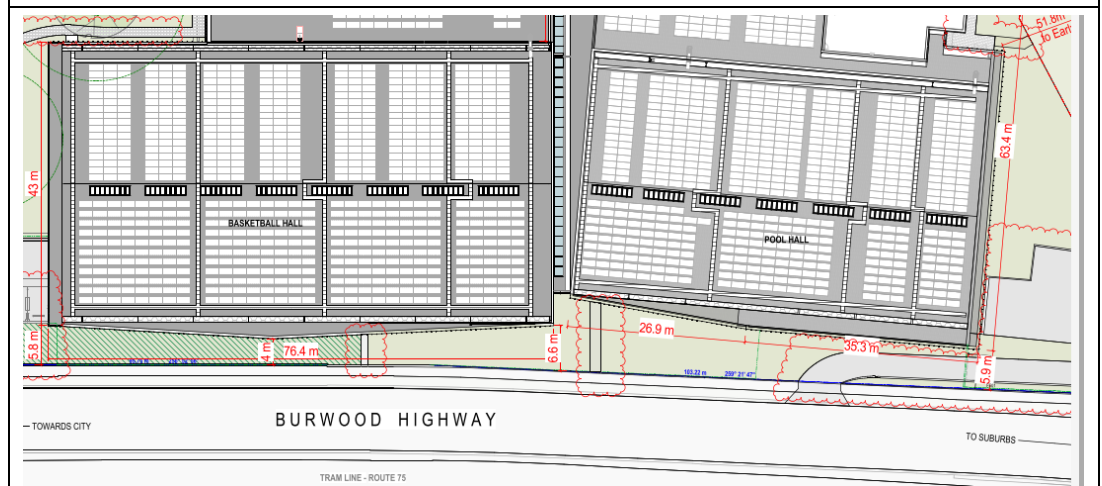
Proposed amended site plan for endorsement aligning within WH/2025/253 endorsed plans
